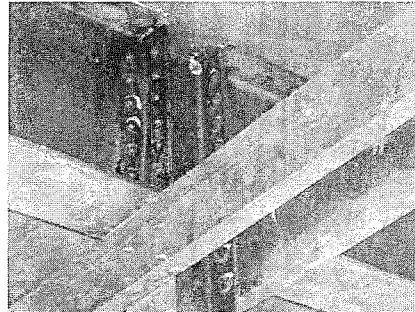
Signs of distress at girder-column joint (Photo: Goel).
